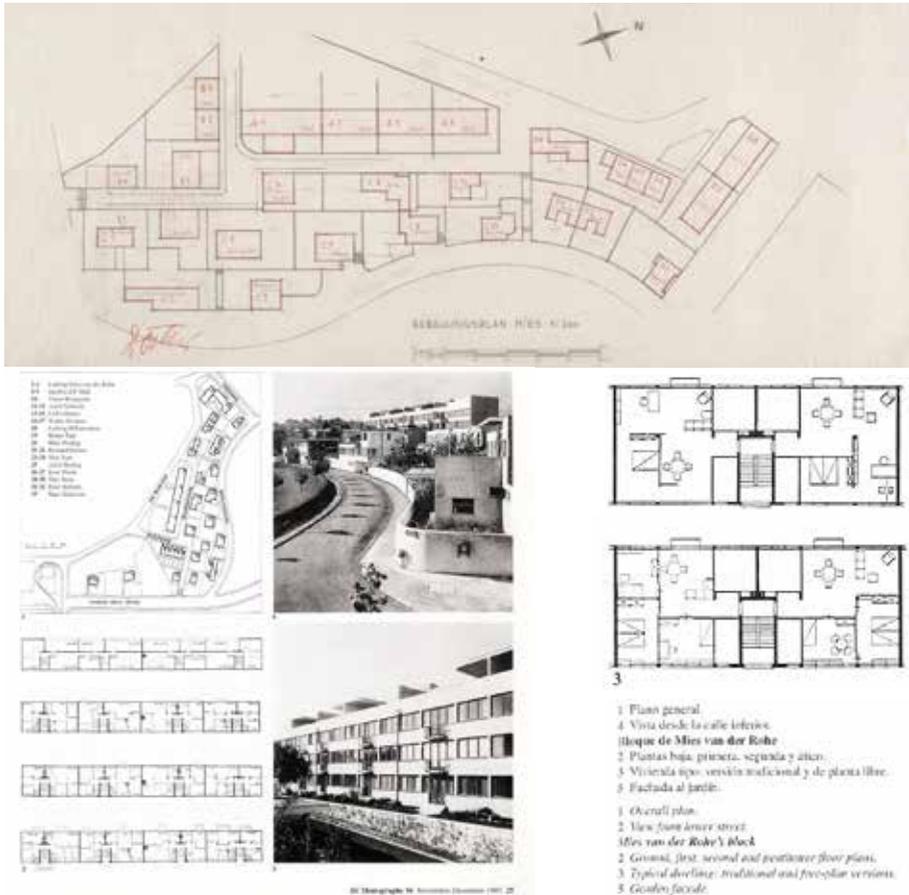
Ludwig Mies van der Rohe, Weissenhof, housing colony master plan. The dwelling Stuttgart Germany site plan, 1926-1927. AV Monographs 56, November-December 1995.
